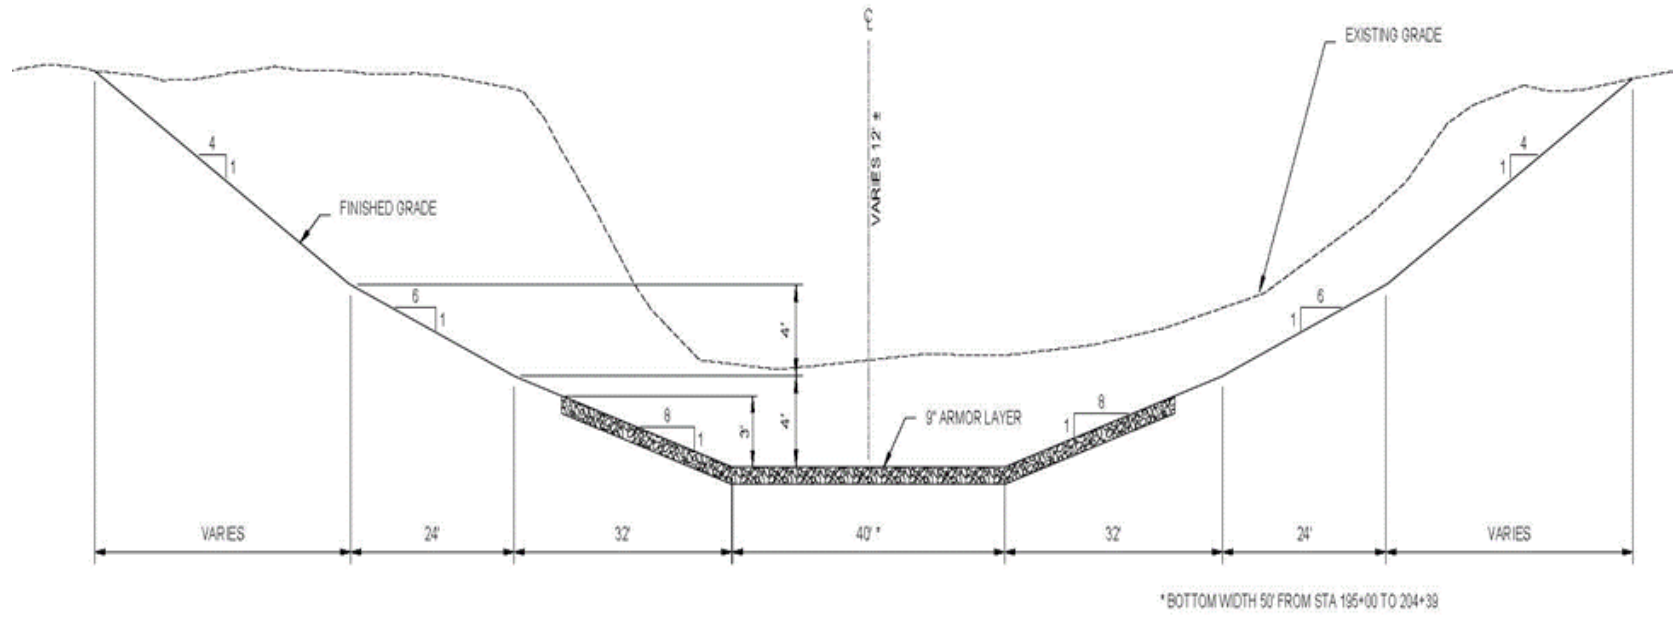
Typical Channel Cross Section, Modified Side Channel
